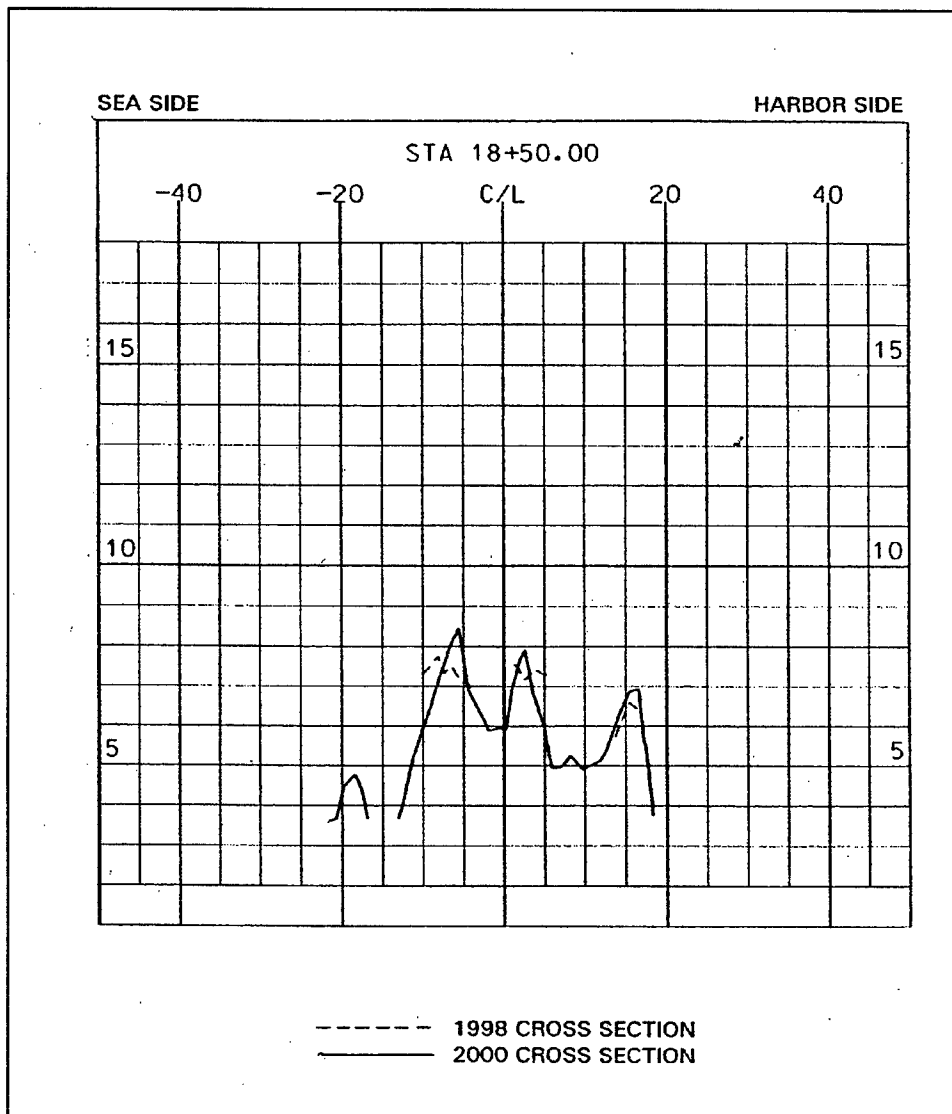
Cross sections of Morro Bay outer south breakwater, sta 18+50
